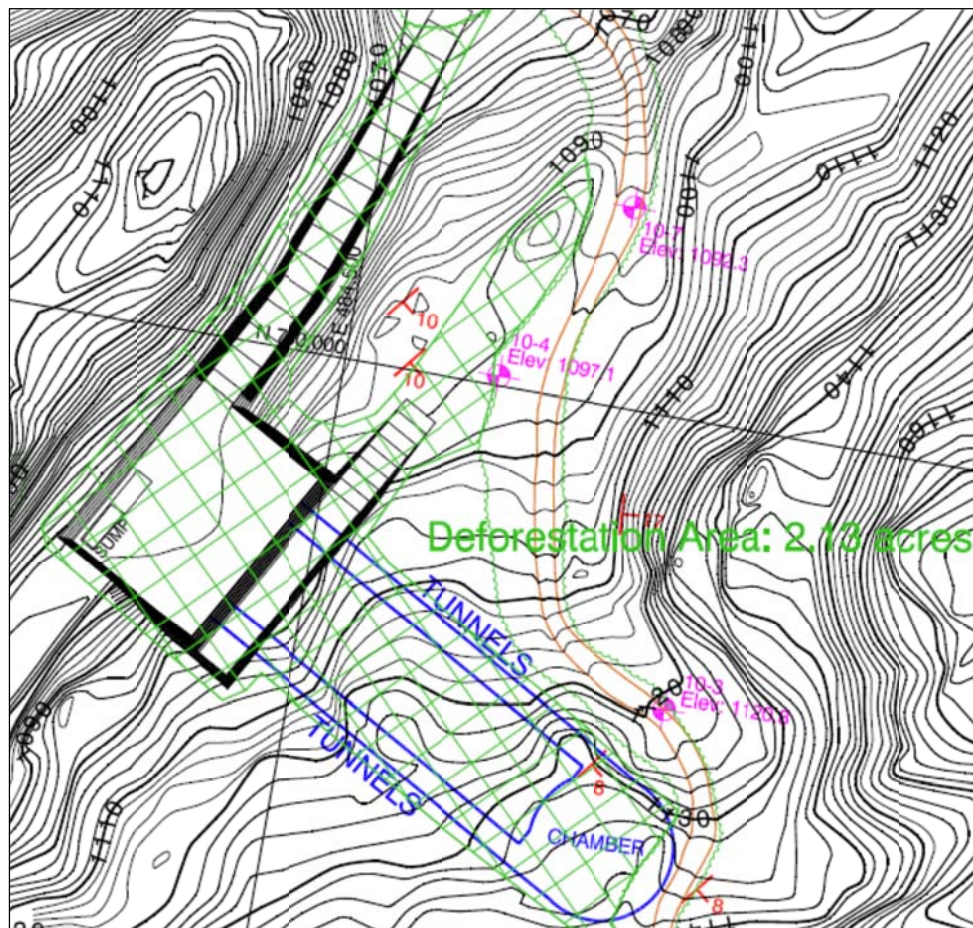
Project Site Layout. (Source: CPI, November 2, 2010)
